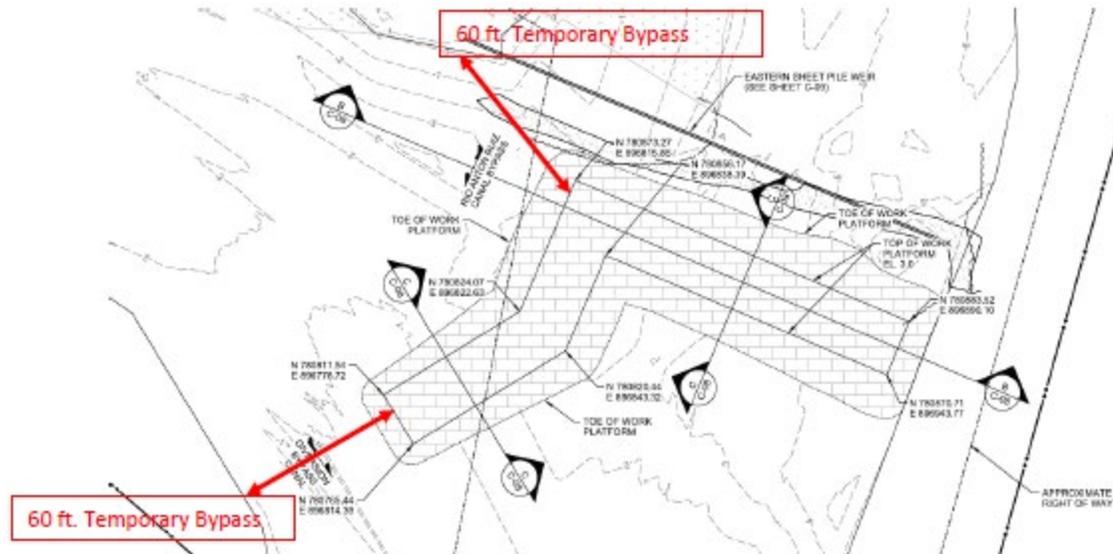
2020 Recommended Plan (Western Conceptual Temporary Work Platform)
